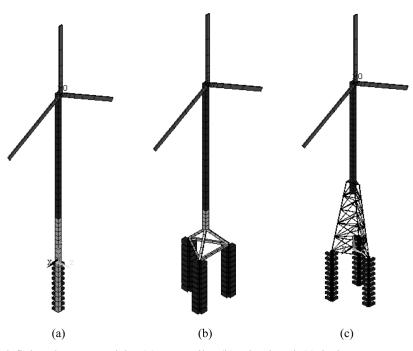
Macro level finite element models: (a) monopile, (b) tripod and (c) jacket support types, springs for preliminary soil-foundation-structure interaction are shown
